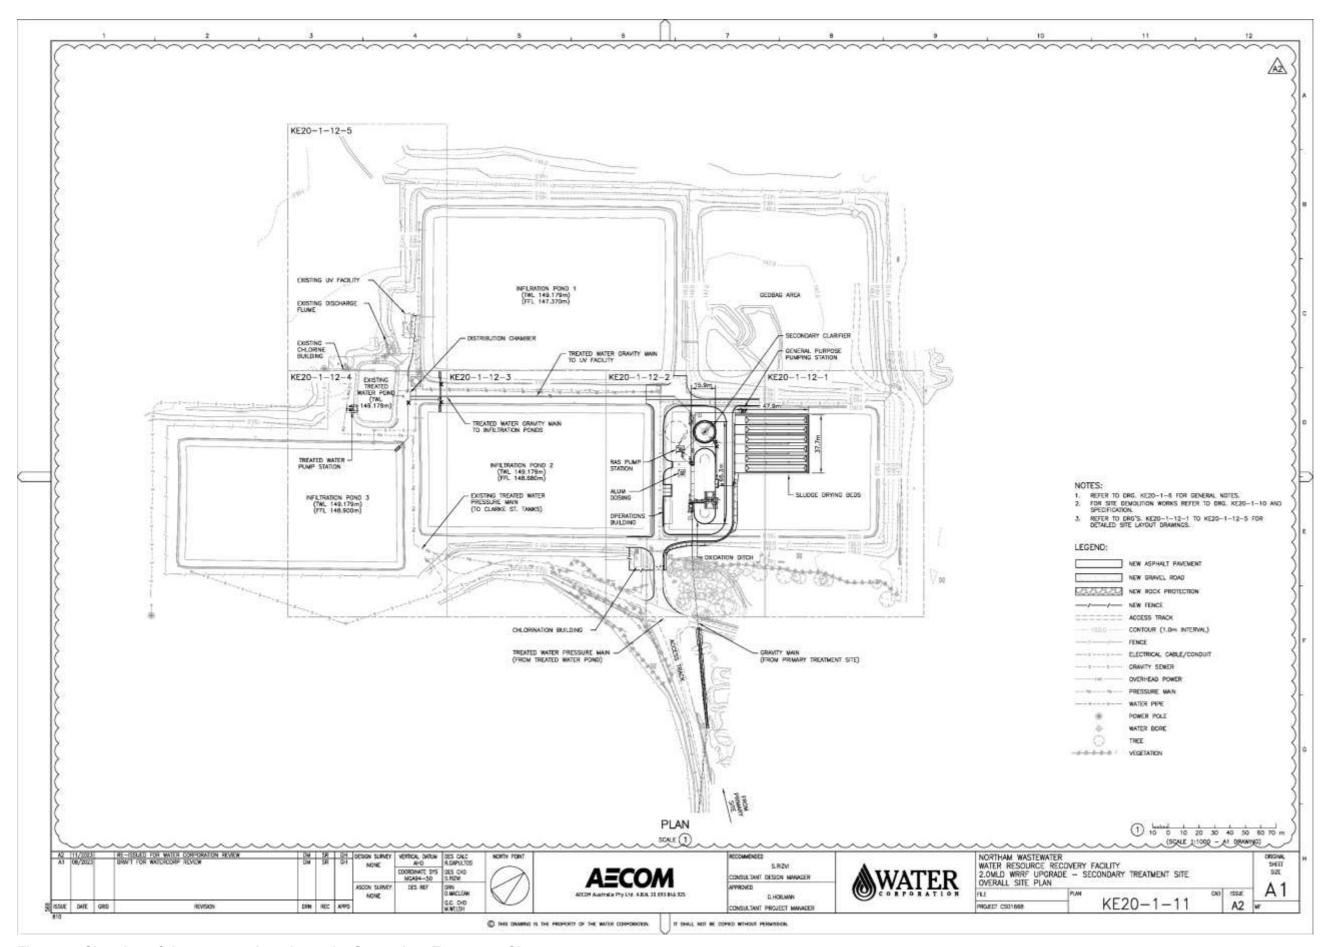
Site plan of the proposed works at the Secondary Treatment Site
